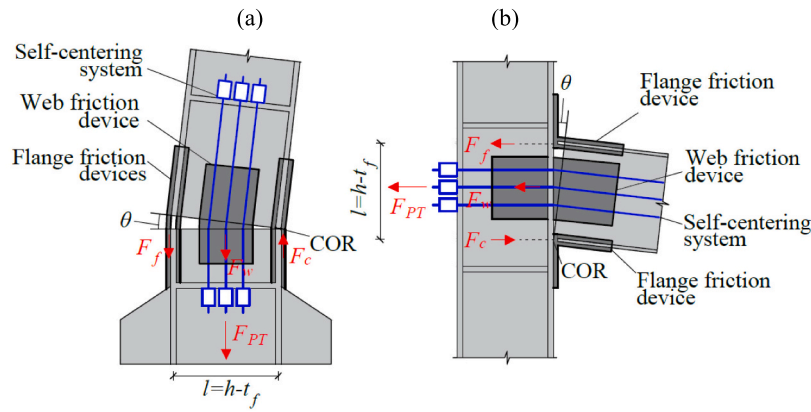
Self-Centering Damage-Free (SCDF) Joints for: (a) Column Bases (SCDF CBs); (b) External Beam-to-Column Joints (SCDF BCJs) (Adapted from Pieroni et al. [40]).
